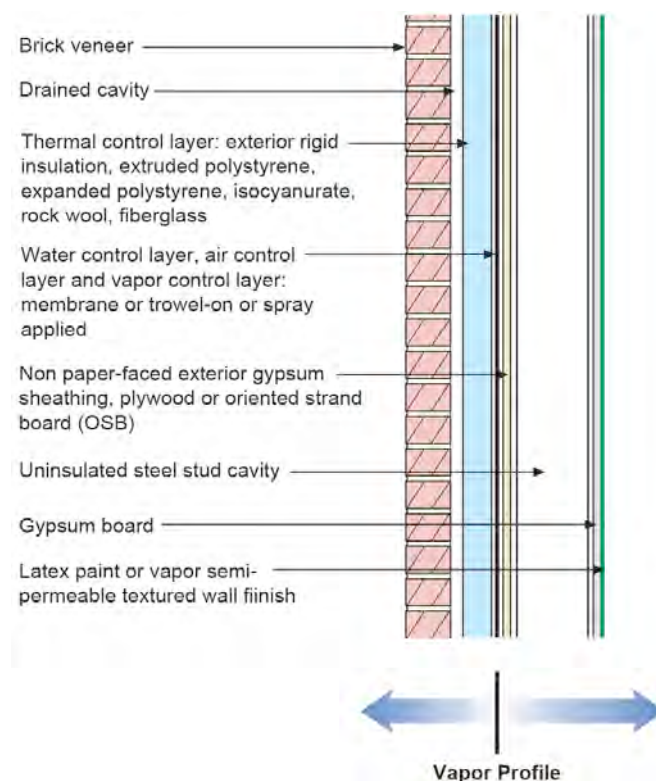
Typical Perfect Wall—The most common manifestation of the perfect wall is a steel framed wall sheathed with exterior gypsum board. Note the vapor profile at the bottom. Drying occurs to the interior from the bold line and to the exterior from the bold line in all climates.
